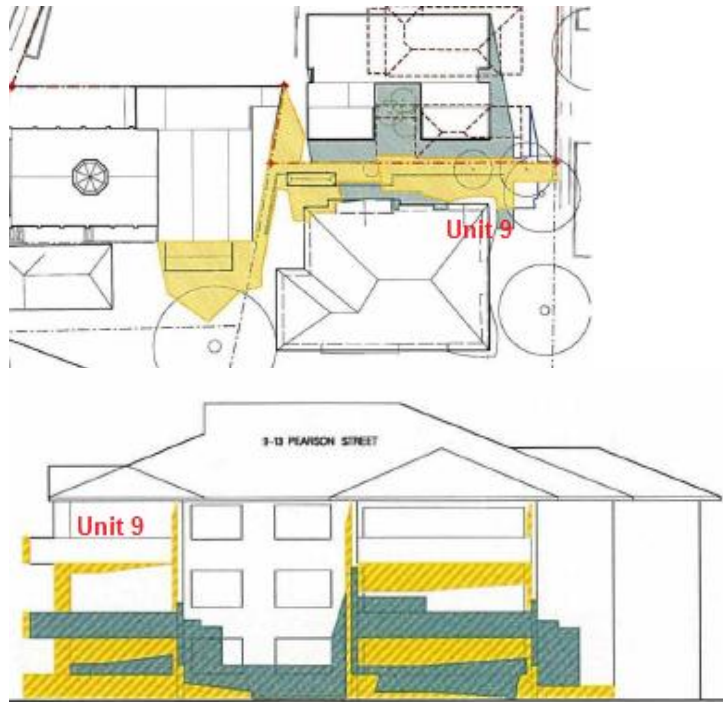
Plan and elevation shadow diagrams at 12 noon – the length of the shadow at 12 noon does not hit the 3rd floor.
